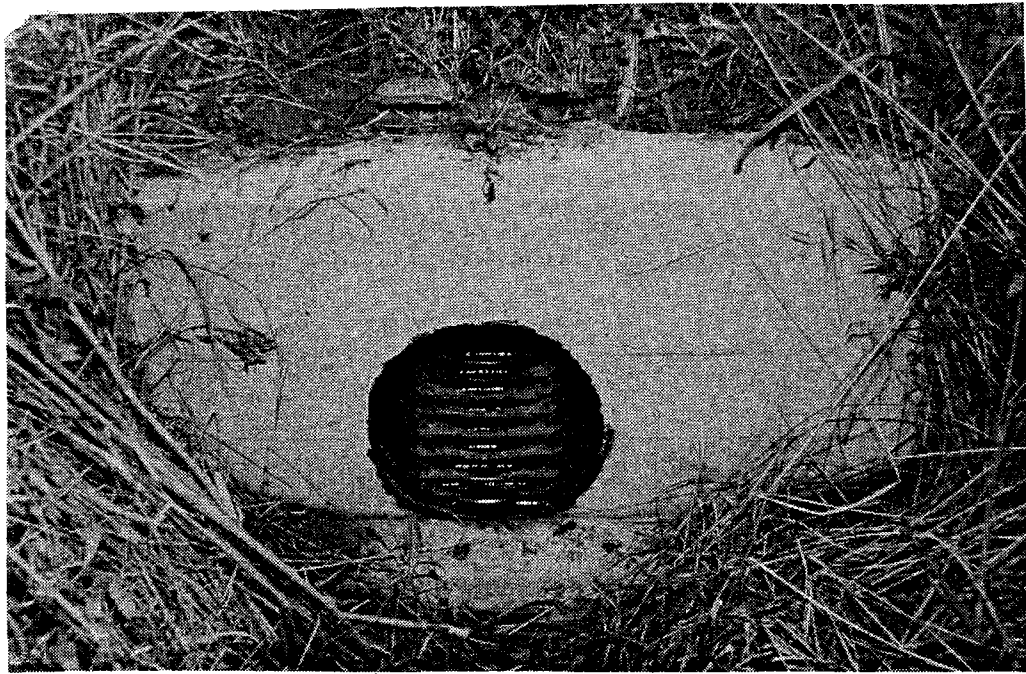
Twelve-inch corrugated polyethylene tubing used for surface water drainage along a county road in Madison County, Ohio. Drain, 1800 feet long, was finished off with a concrete headwall at both ends.
